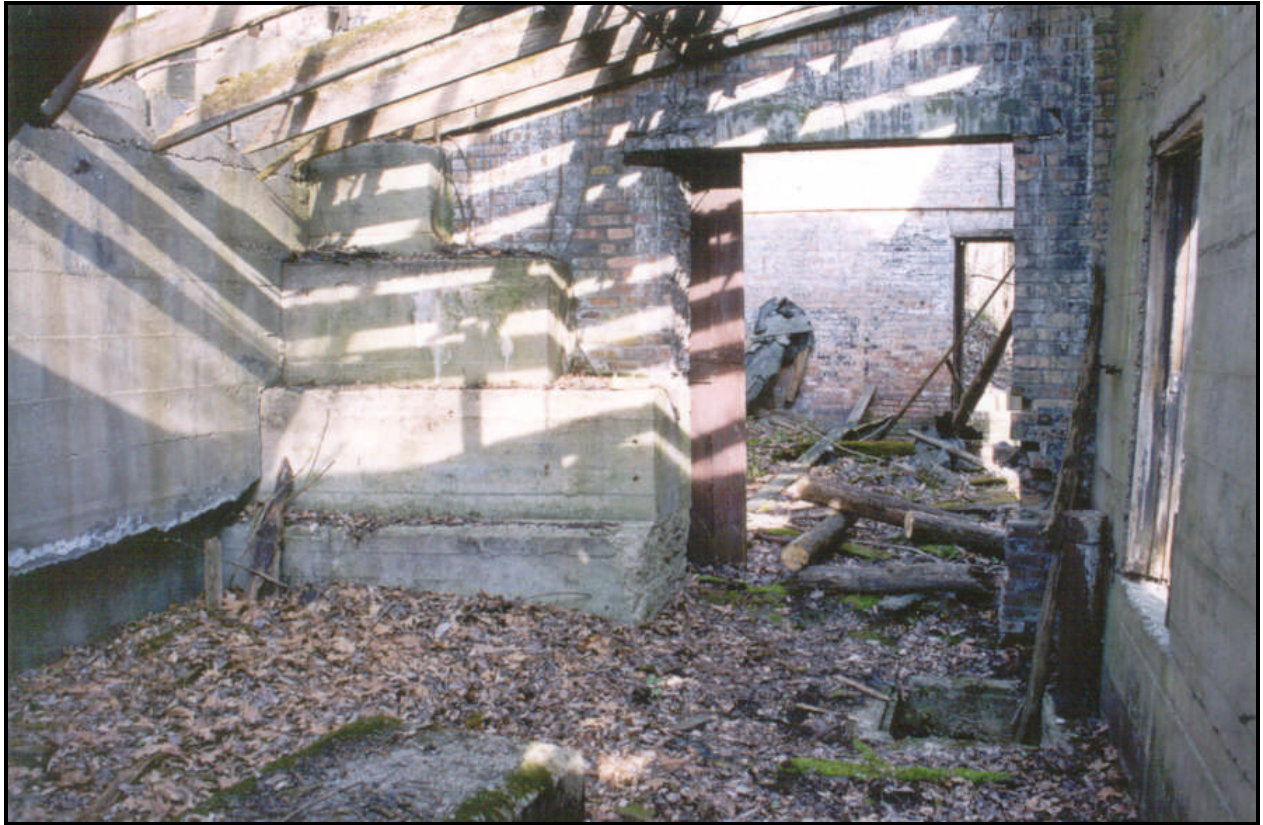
Interior view of the first addition to the fan house complex, looking east. This room is believed to have been used as a pump room. The concrete pad in the foreground possibly supported a water or fuel pump originally (FRR April 2003).
